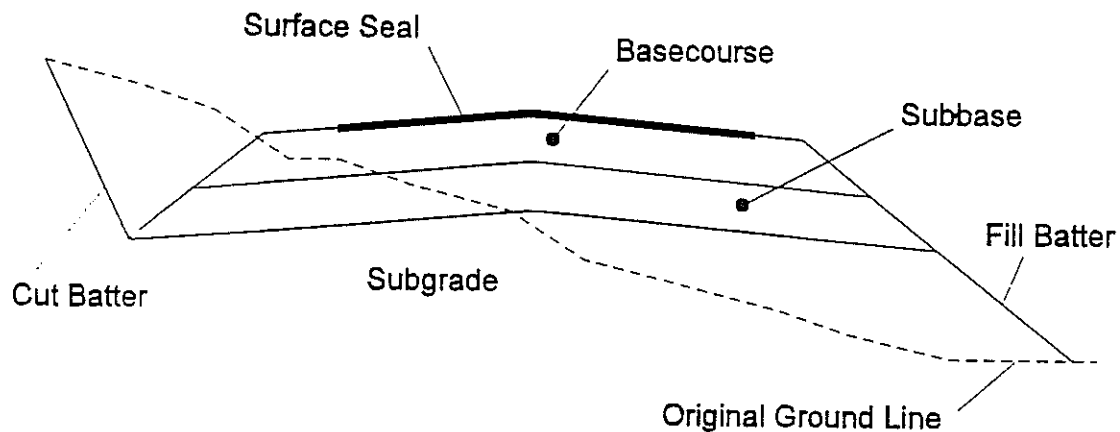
Structure of a typical sealed unbound granular pavement used in New Zealand roads.
